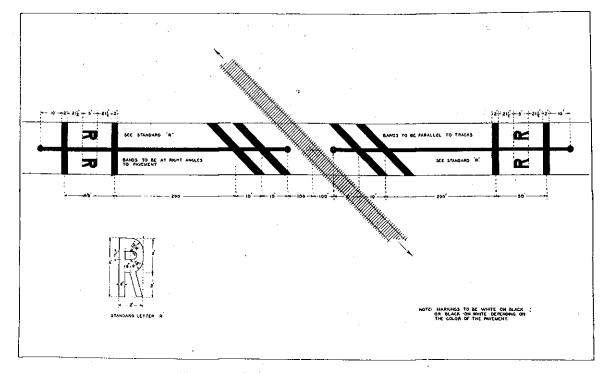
Railroad Crossing Pavement Markings Black on light colored pavement White on dark colored pavement
